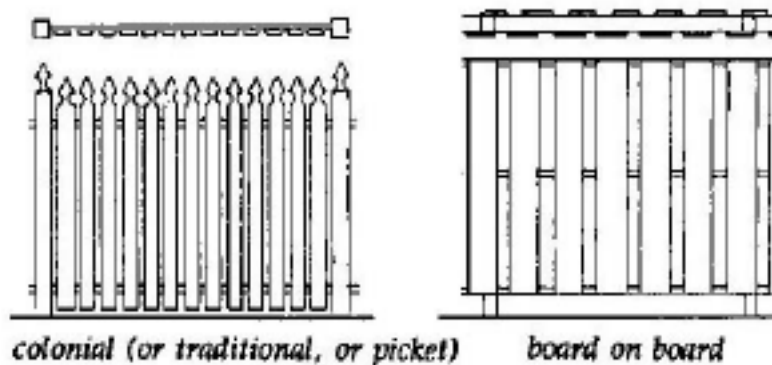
Typical fence styles found in some backyards of Original Northwood
